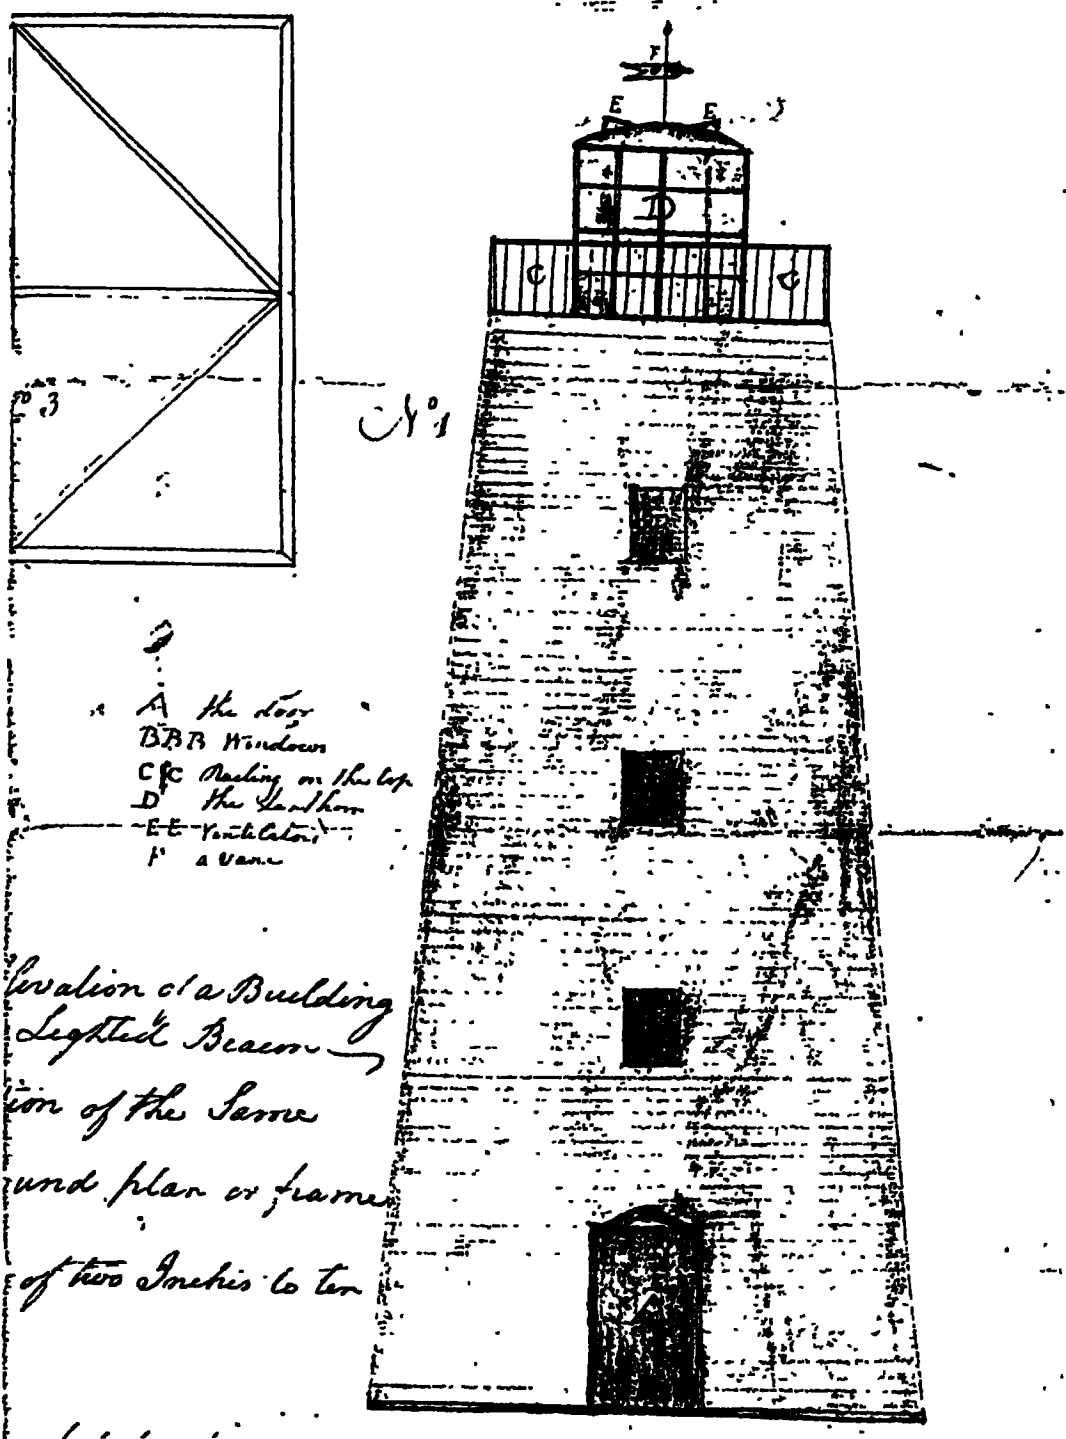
Elevation of Building a Lighted Beacon by William Allibone, 1794. (Source: Lighthouse Letters, Miscellaneous Correspondence, RG 26, NAB)
